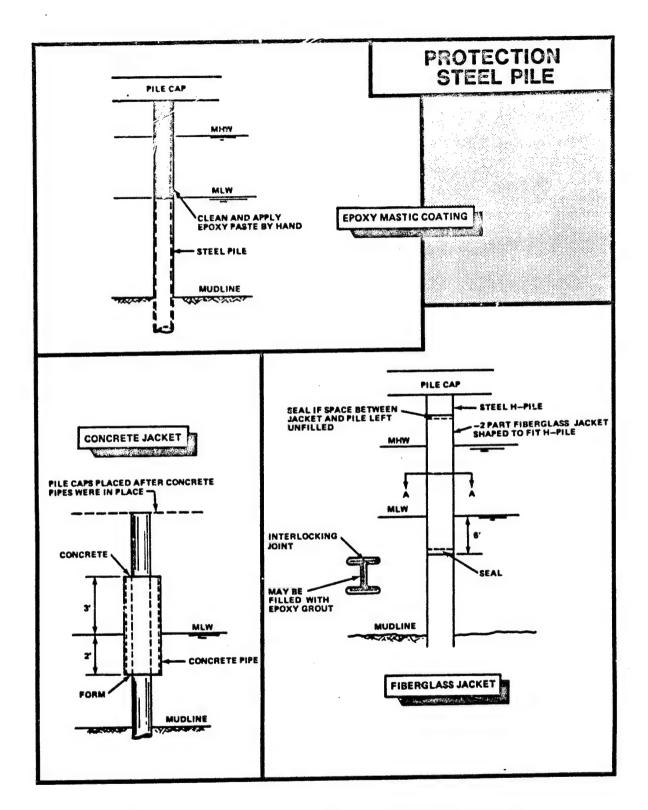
Protecting Steel Piles by Coating or Jacketing.
